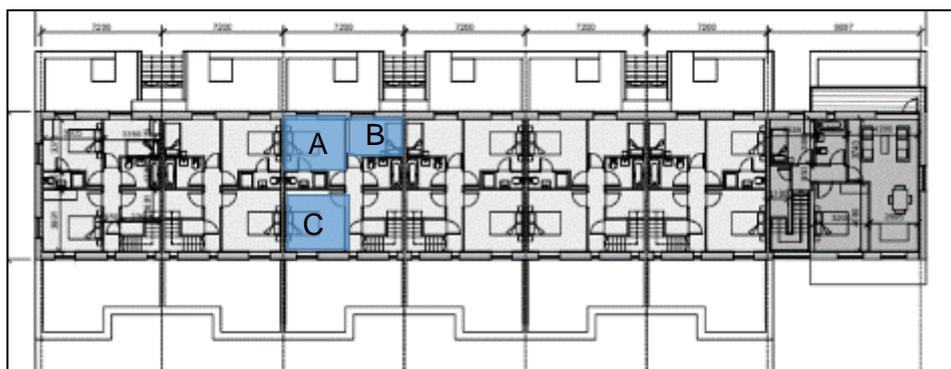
Block C1 – Second Floor Assessed Rooms Highlighted in Blue
